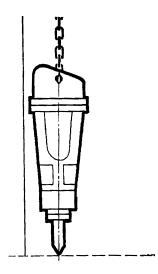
YES - always keep the breaker perpendicular to the rock or to any surfaces
